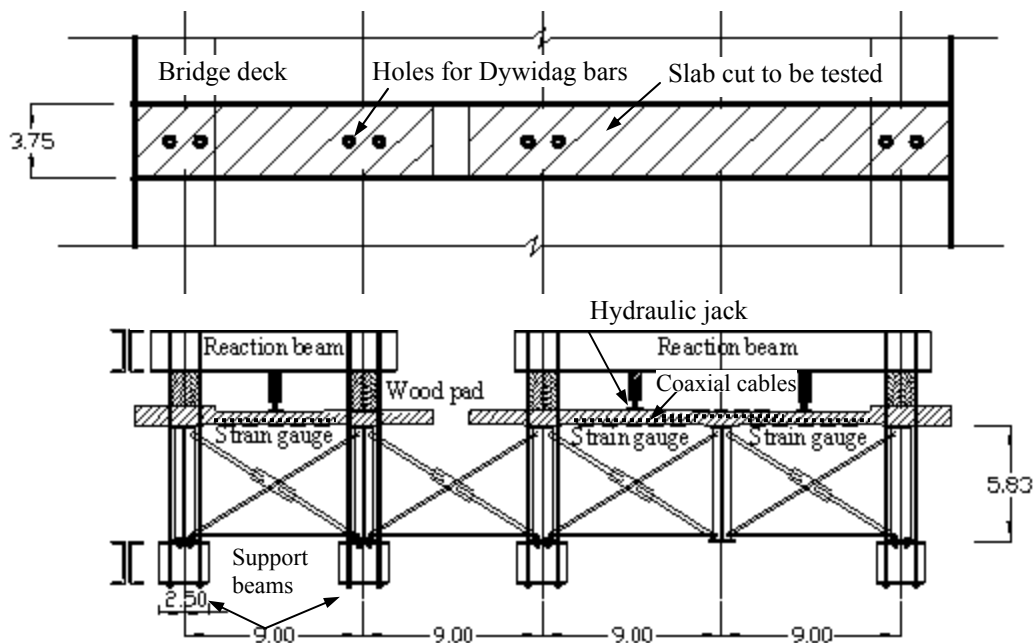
Test Setup for Bridge Deck (all dimensions in ft)
